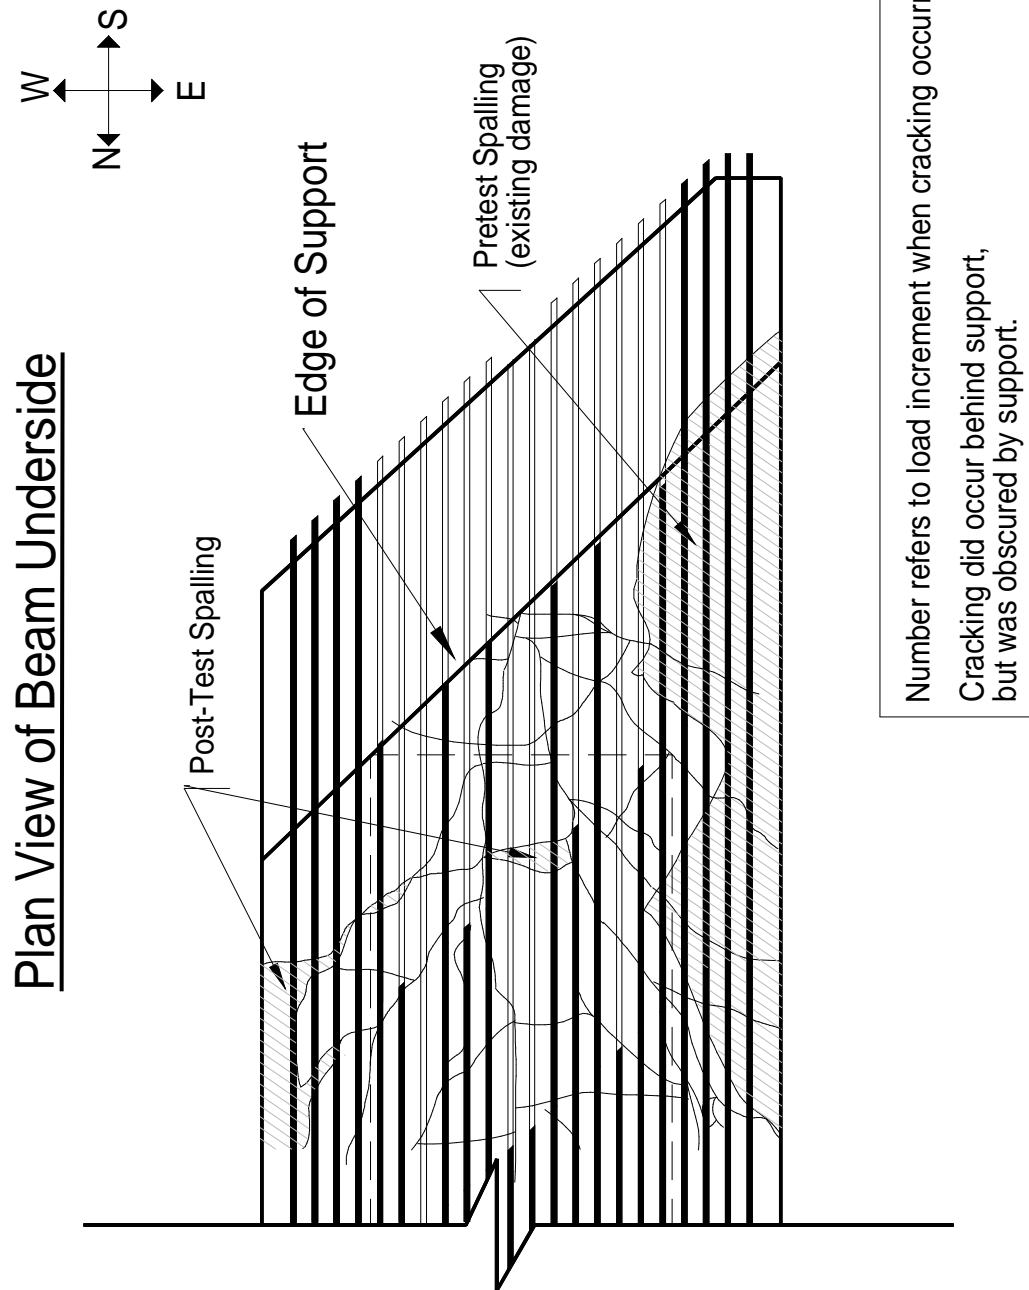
Post-test Cracking in Bottom Flange of Box Beam 5 - Test 2 w/ superimposed pretensioned steel
